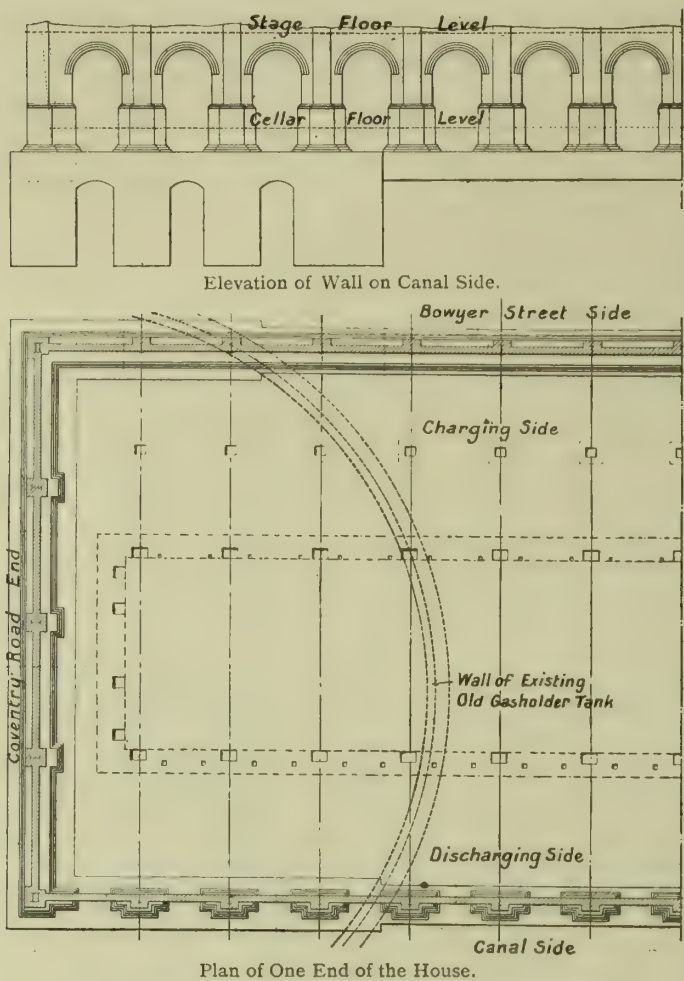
Foundations for the Retort-House and Retort-Bench.
